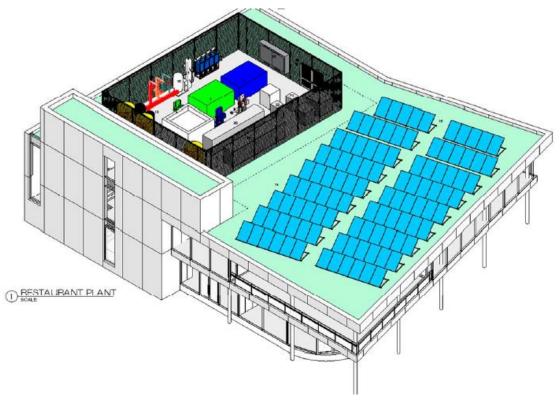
Proposed Café, Retail and Restaurant Roof Level Plant Area
